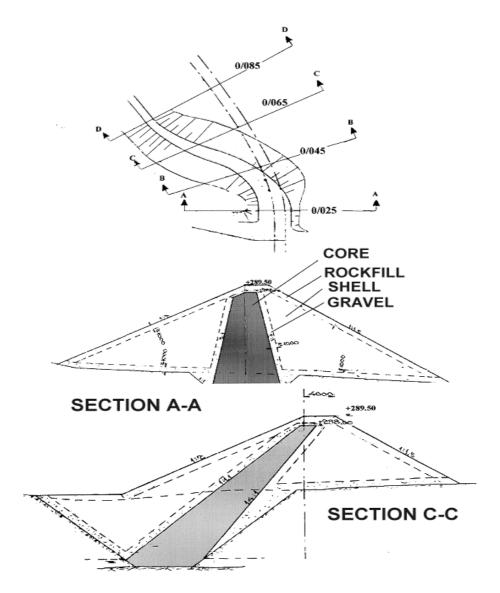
Plan (detail) and two sections over Lövön Embankment dam.
